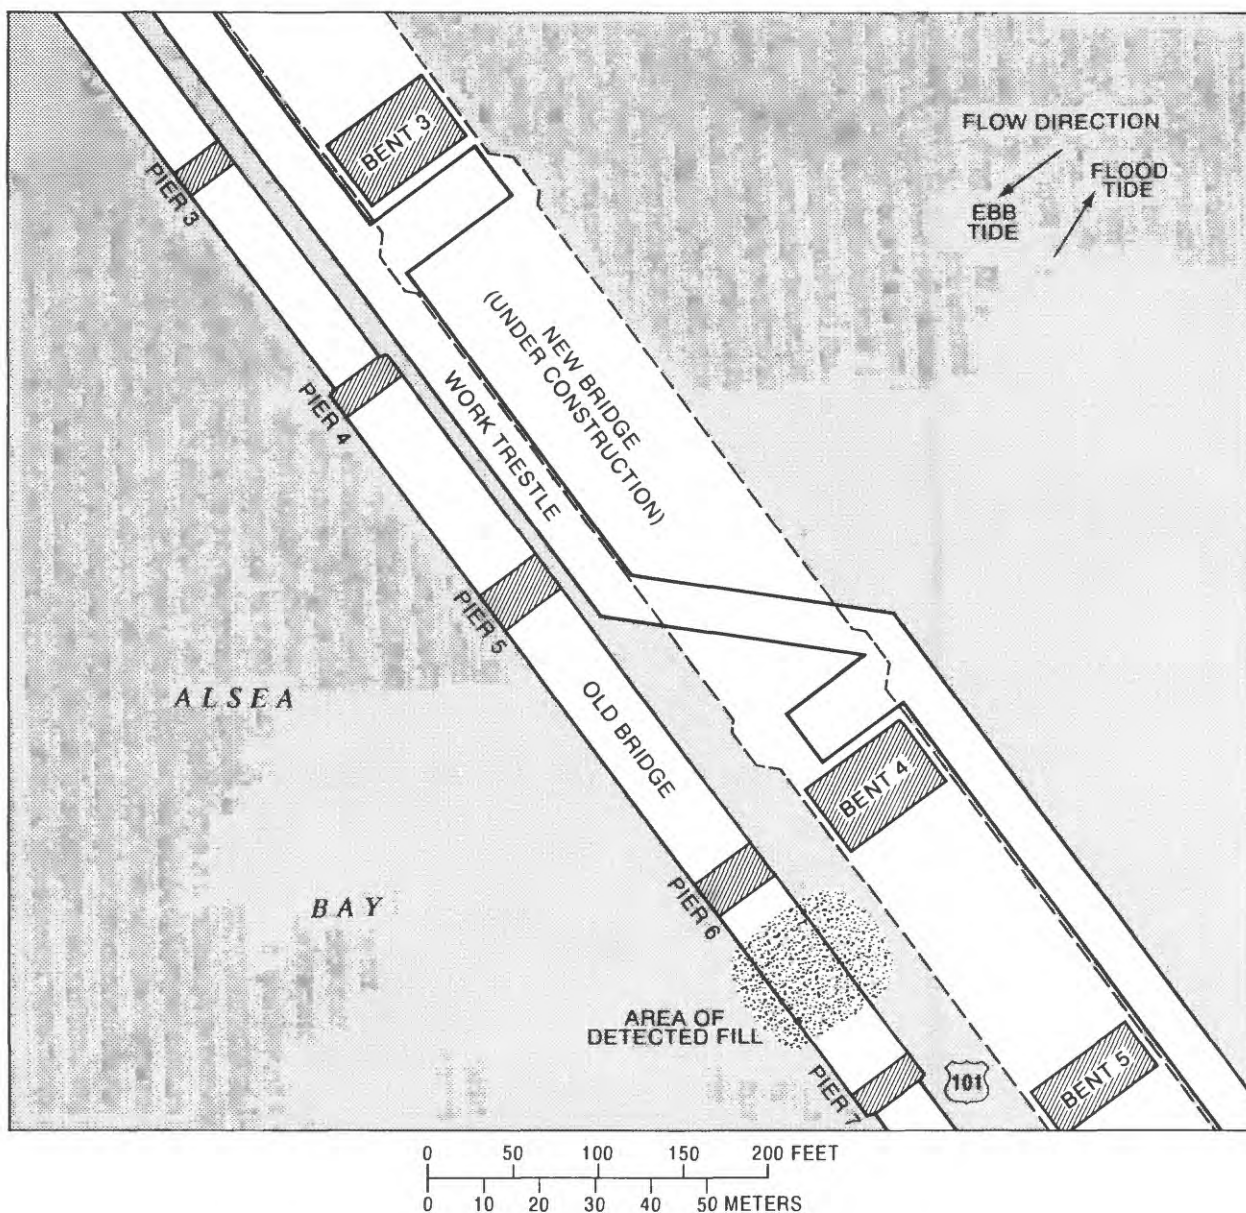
Plan view of Highway 101 bridge and construction trestle at Alsea Bay, Oregon.
